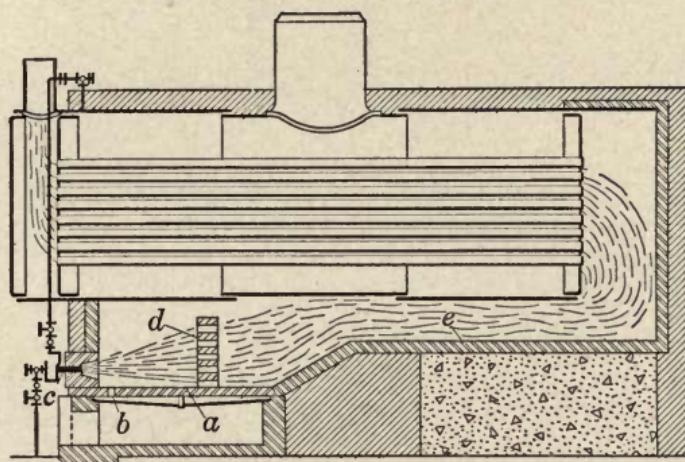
Return-tubular boiler with Kirkwood oil burner.
